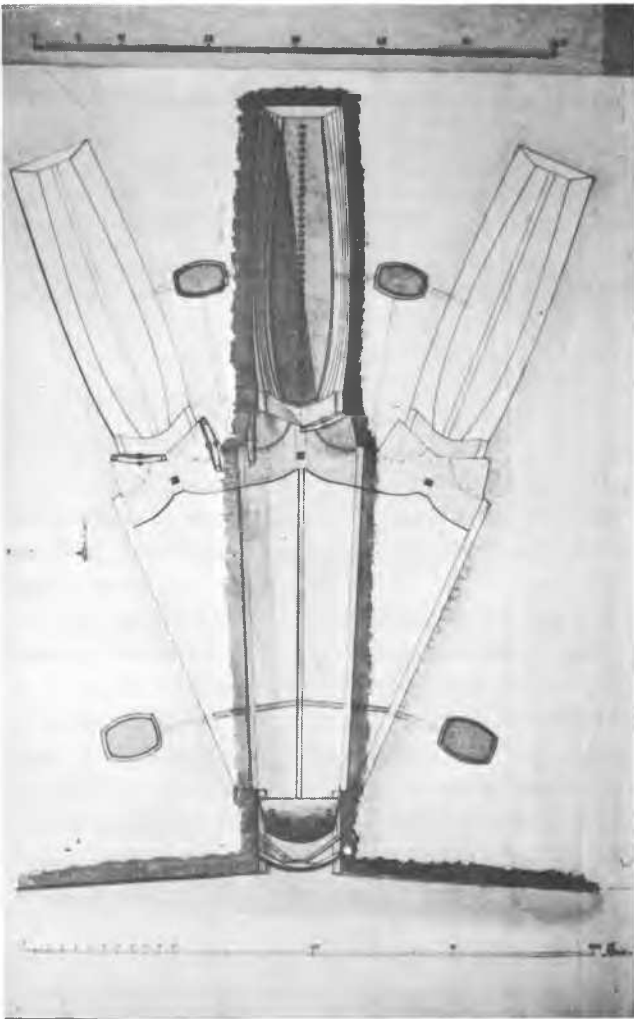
Original drawing of the 1796 drydock by Swedish engineer Rhodé showing the drydock, dock entrance and two possible extensions.
